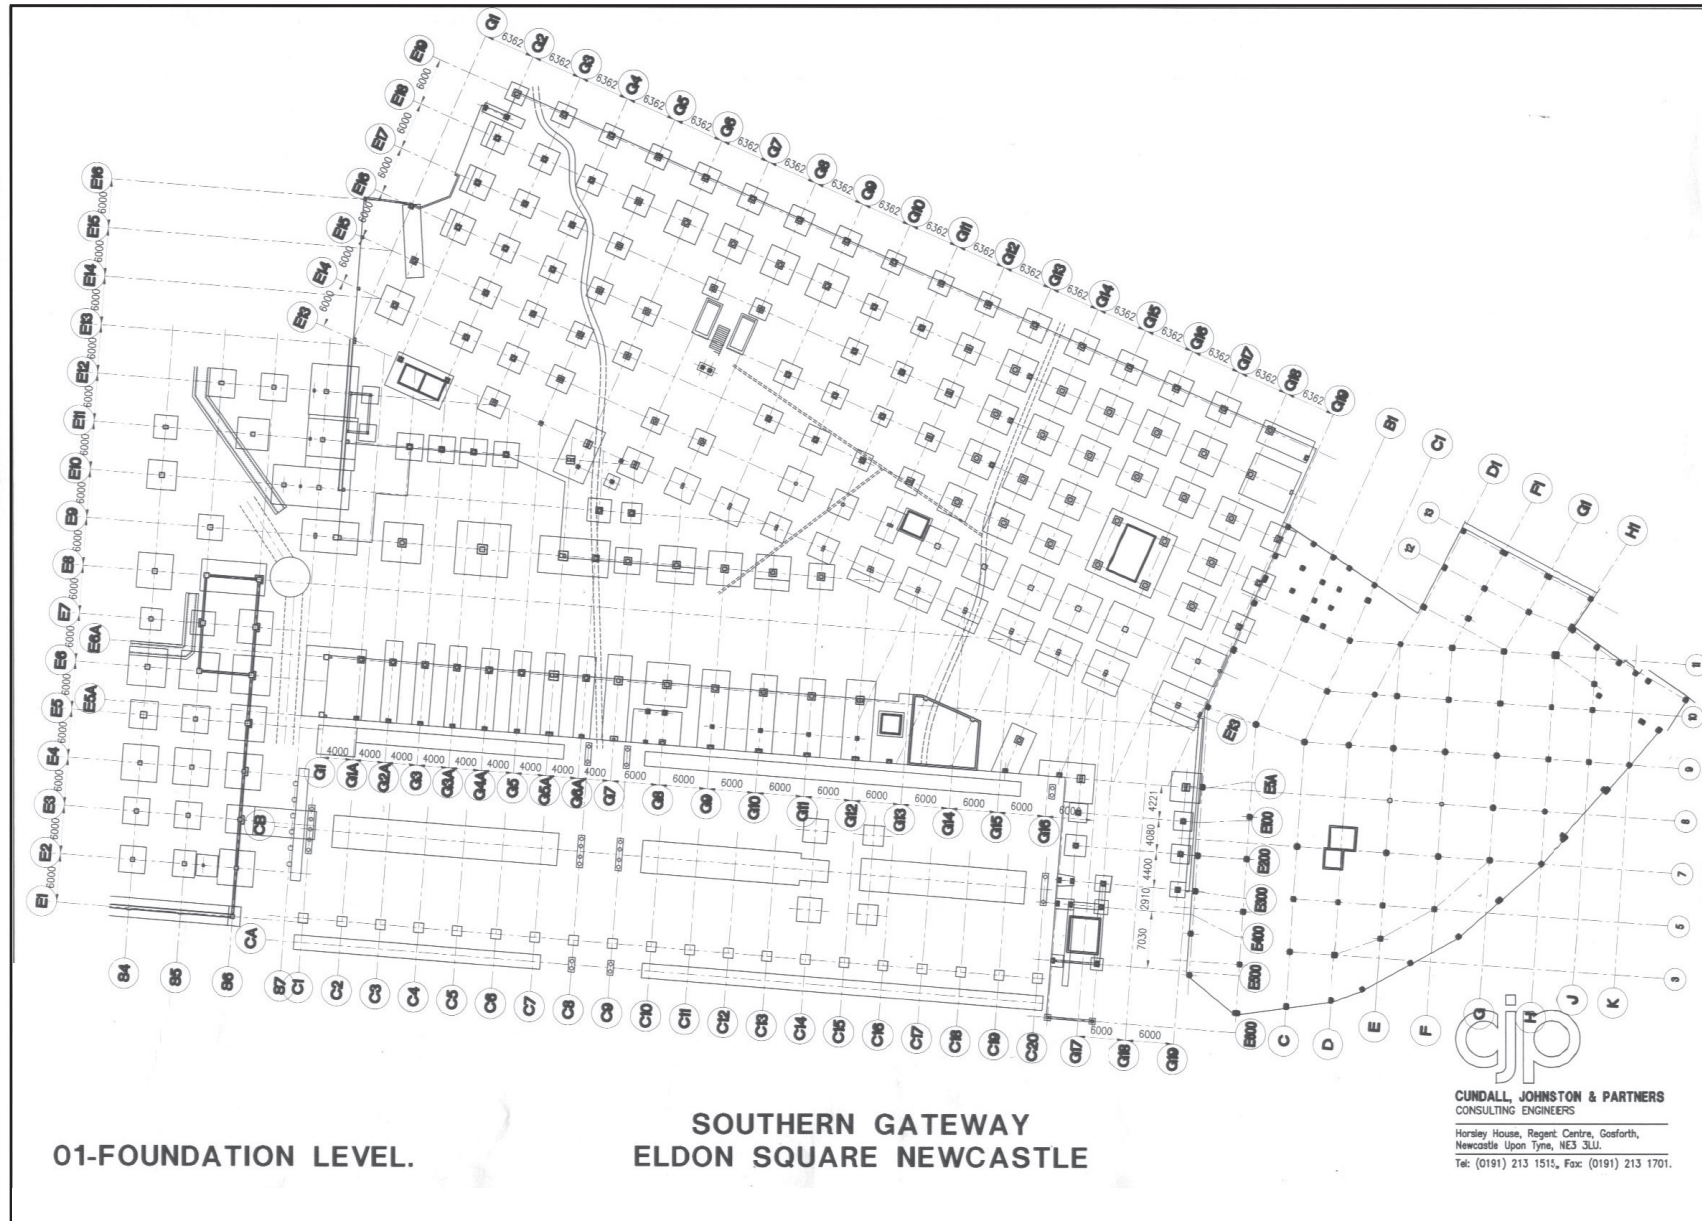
Composite foundation plan of the Southern Gateway area (supplied by Cundall Johnston and Partners LLP)
